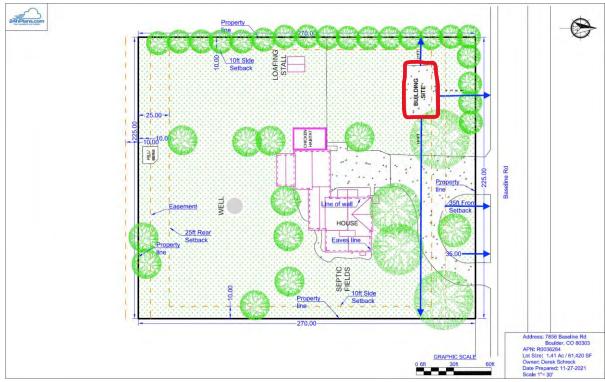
Applicant's site plan showing proposed barn location outlined in red (North to the right).
